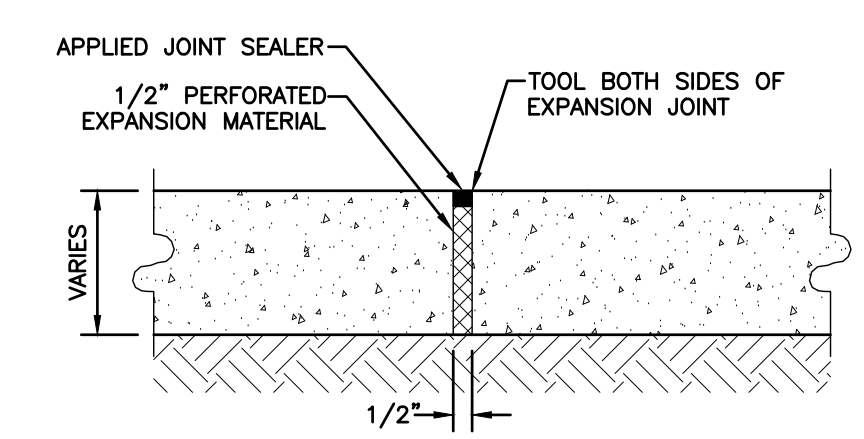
PAVEMENT WITHIN RIGHT-OF-WAY PAVEMENT SECTION
